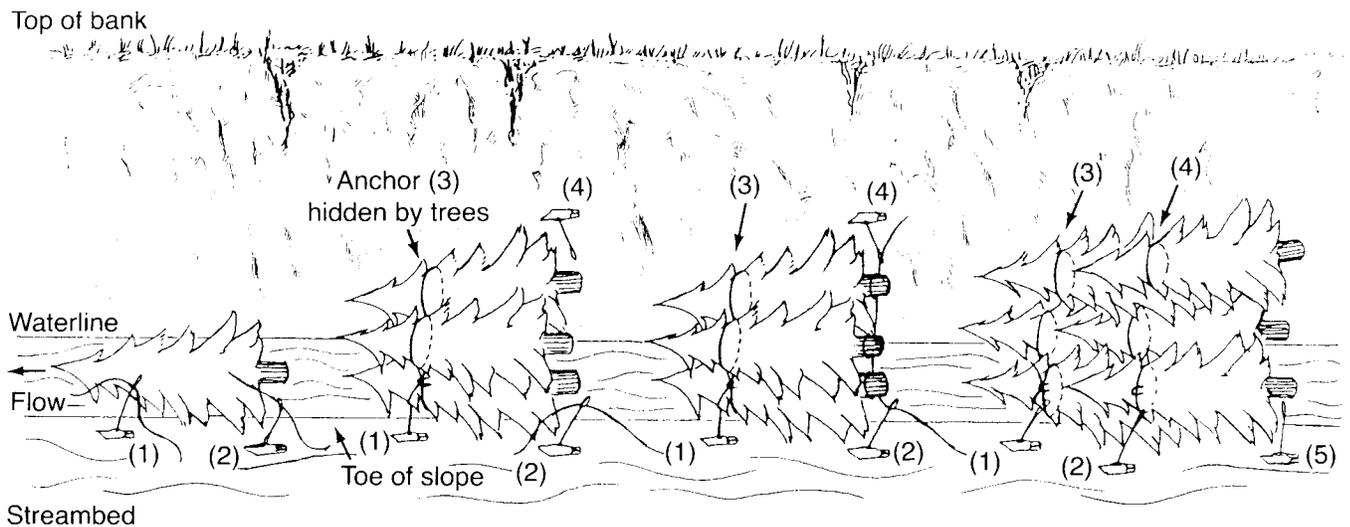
Constructing a Multiple-Row Revetment - Figure shows the general placement of cable. Cable should be wrapped around trunks only and not the outside branches. Compress the trees, pull the cable together as tight as possible and clamp tightly.
